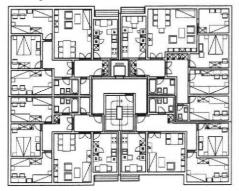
Position of the staircase and typical building's built from the early 80's up till now.
